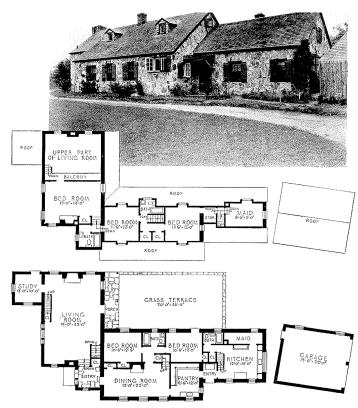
Floor Plan, Marston, Van Pelt & Maybury, Architects, "The House of Gillespie," *House Beautiful*, May 1927: 642.
